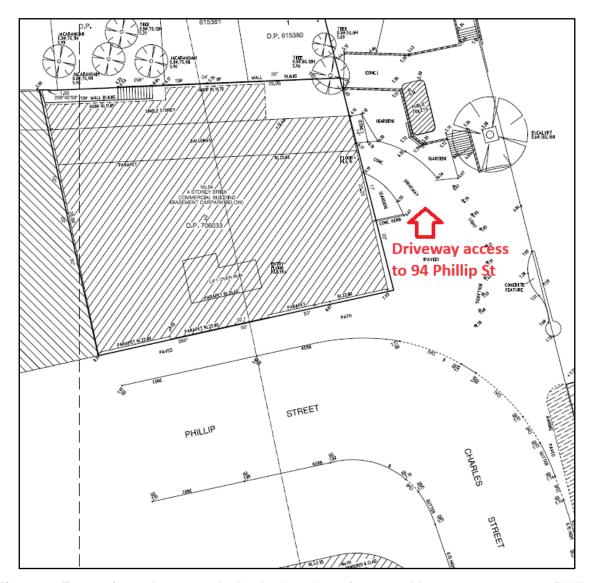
Extract from site survey indicating location of current driveway access to 94 Phillip St over unmade portion of Charles Street (Source Applicant's site survey – Norton Survey Partners)
